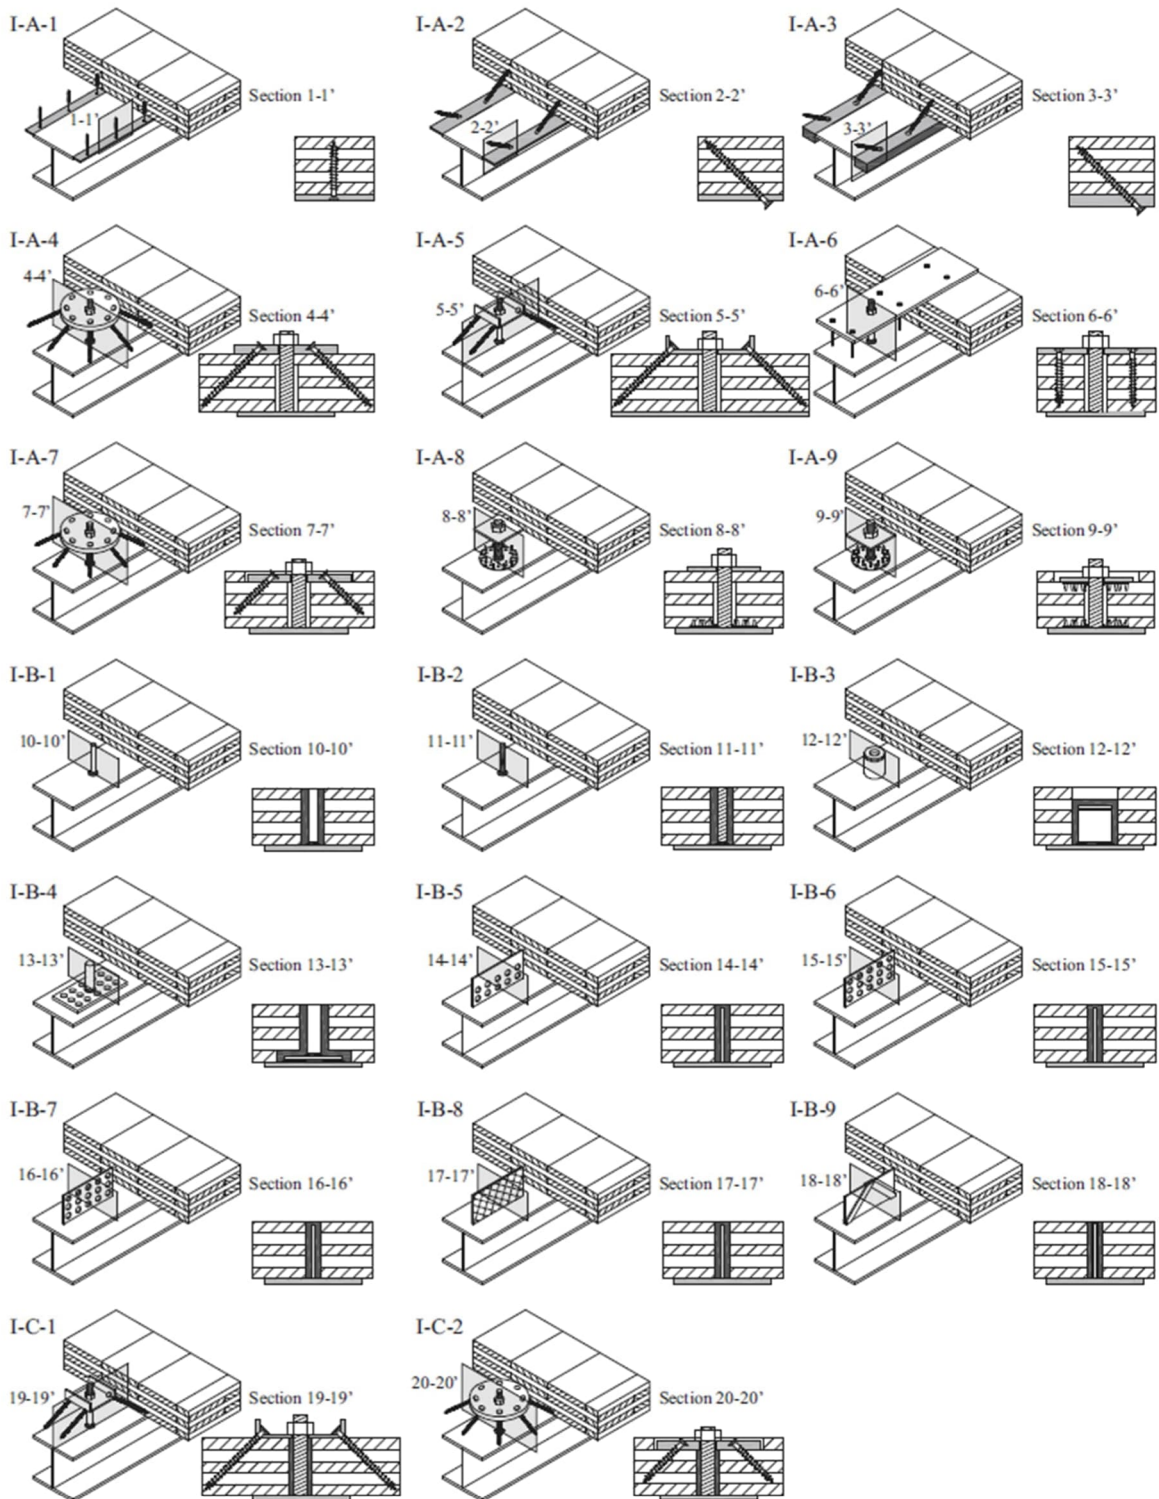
Beam-to-panel connections for hybrid steel-CLT floors and shear wall [54]
